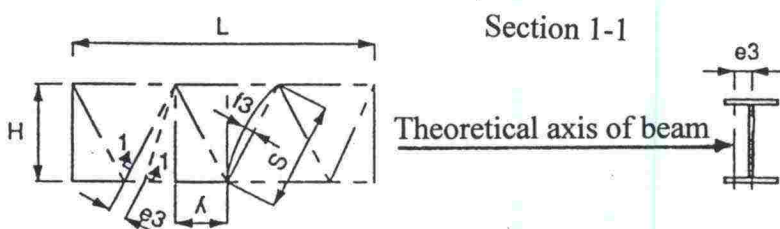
TRUSS GIRDER, 1-1 SECTION
